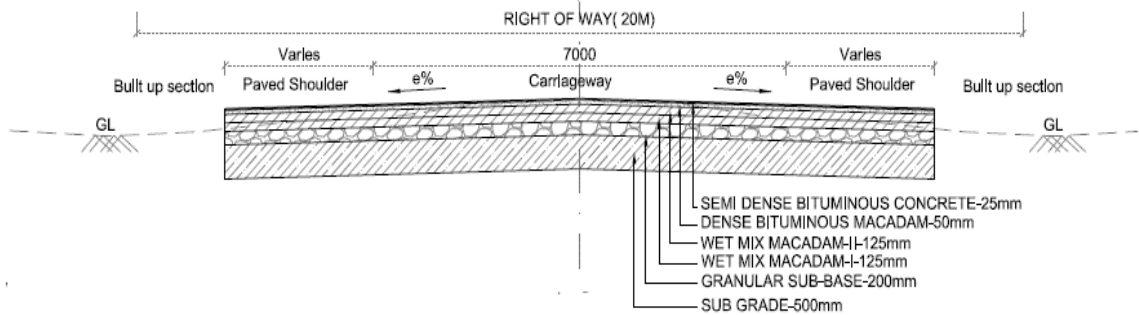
(TCS 3) 2-Lane Flexible Pavement with Paved Shoulder
